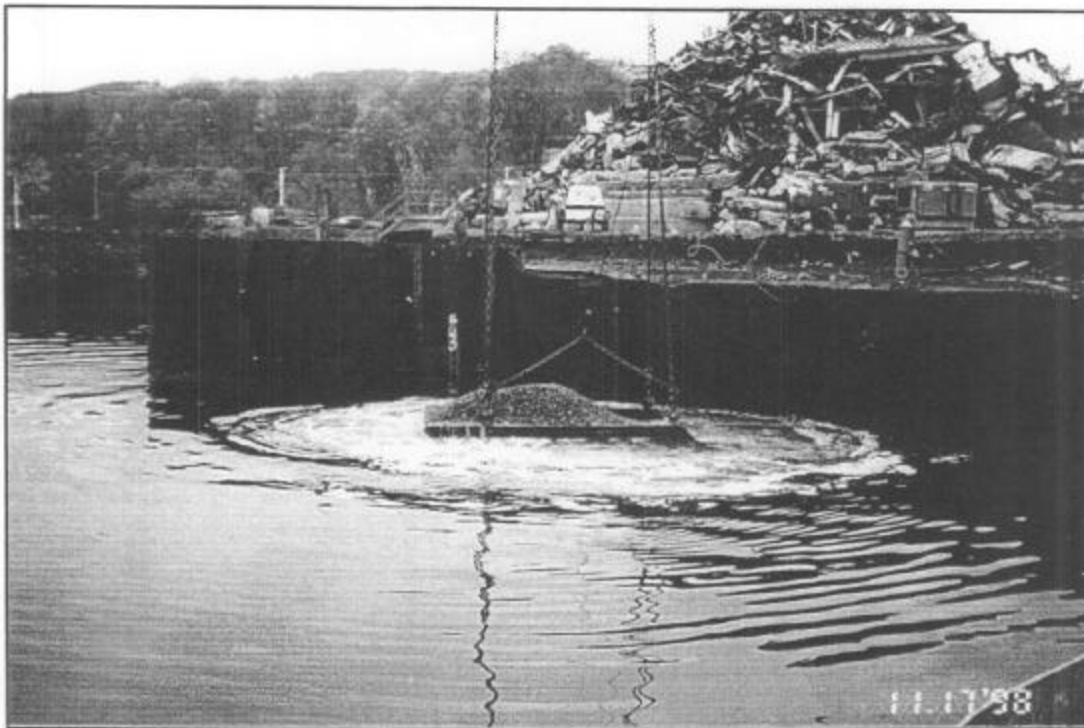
Raising Bucket Before Placing Sand and Gravel
